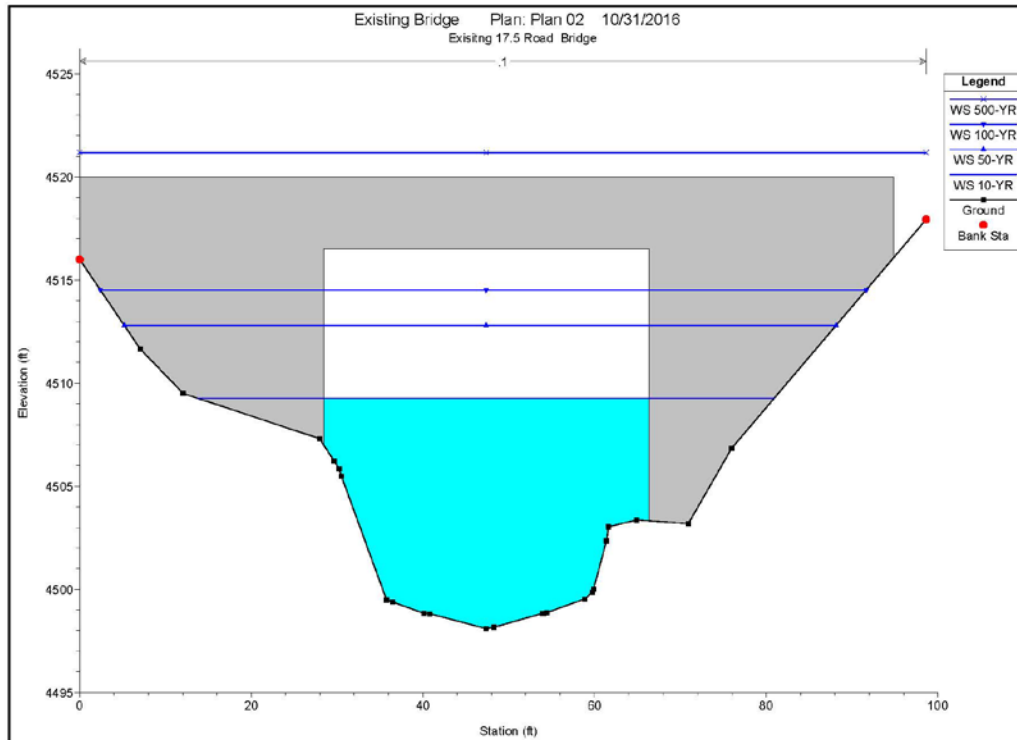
HEC-RAS cross-section of the existing 17.5 Road bridge and Little Salt Wash channel. 100-year water surface elevation is 4514.52. Lower chord of the bridge is at 4516.5 feet.
